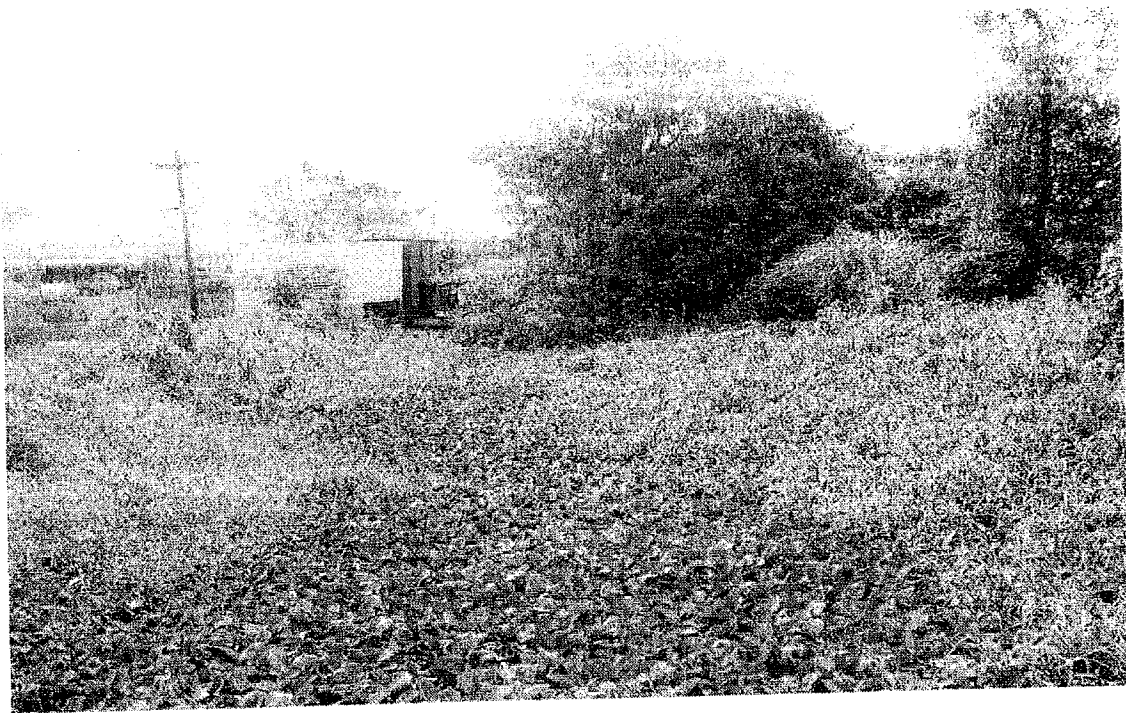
Bechara Channel north. Structure at left is the existing pump house. Note how canal is choked with vegetation.
